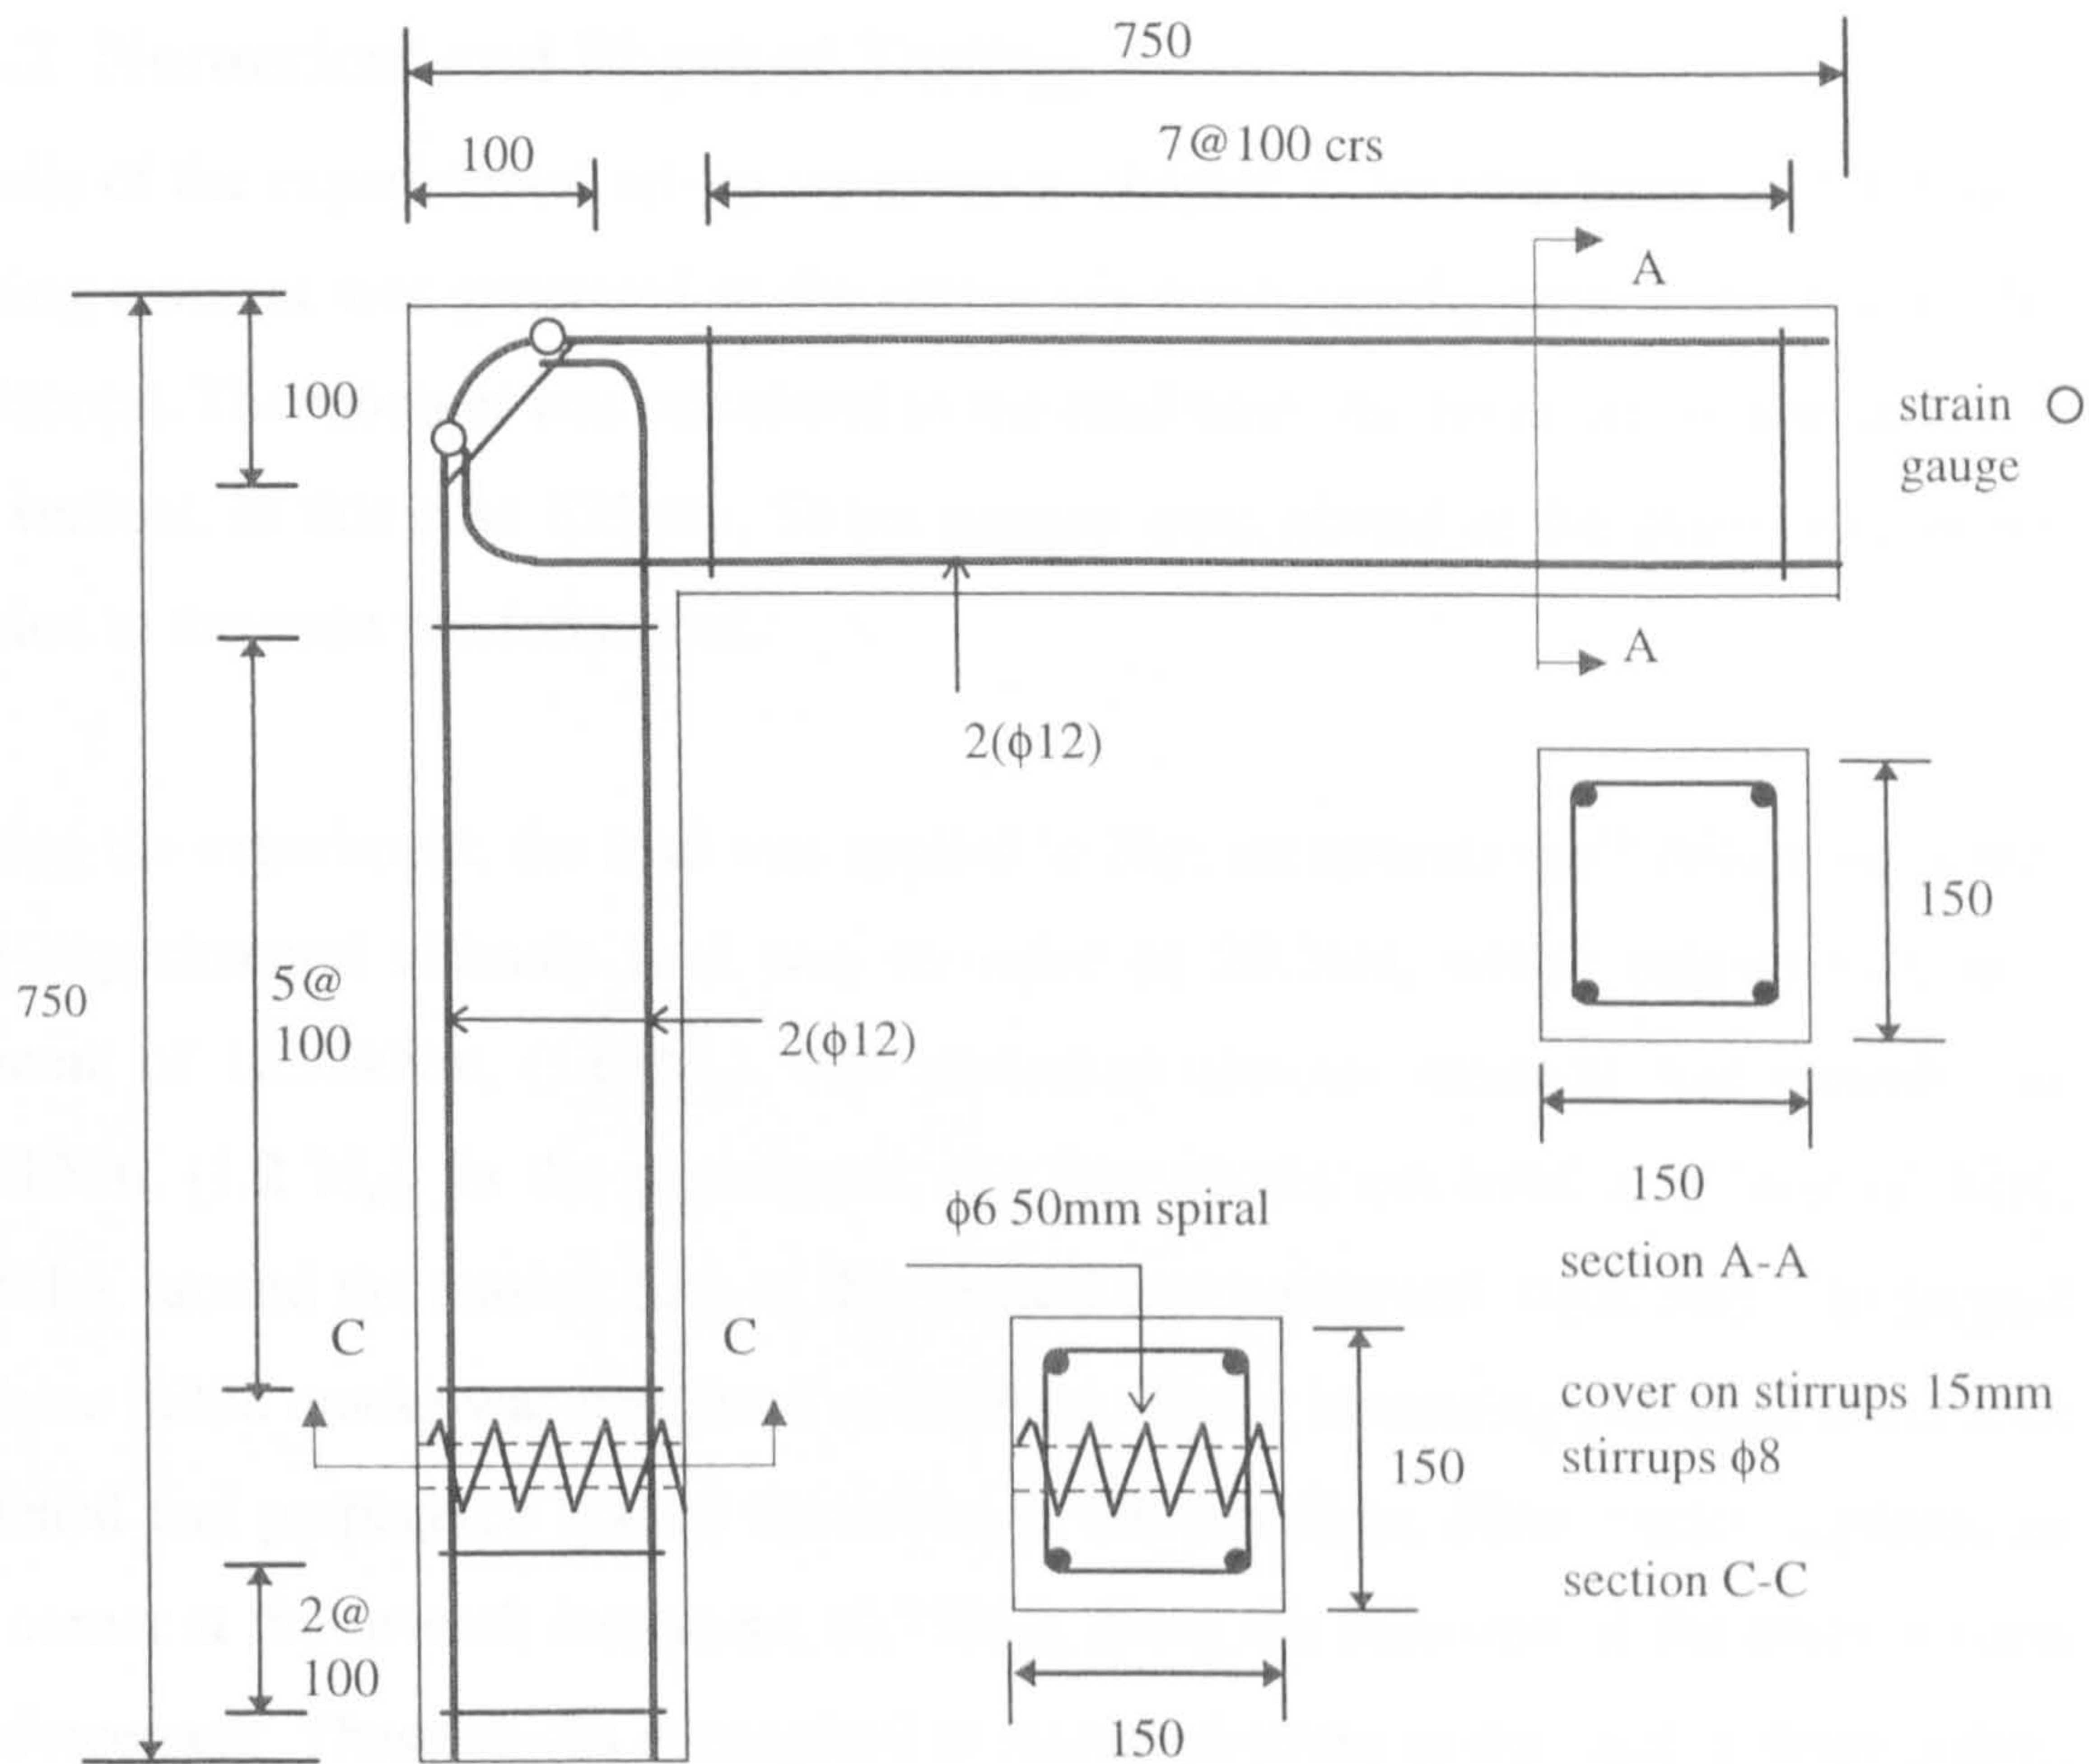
(i) Corner FJ1A Reinforcement Layout, all sizes in mm
